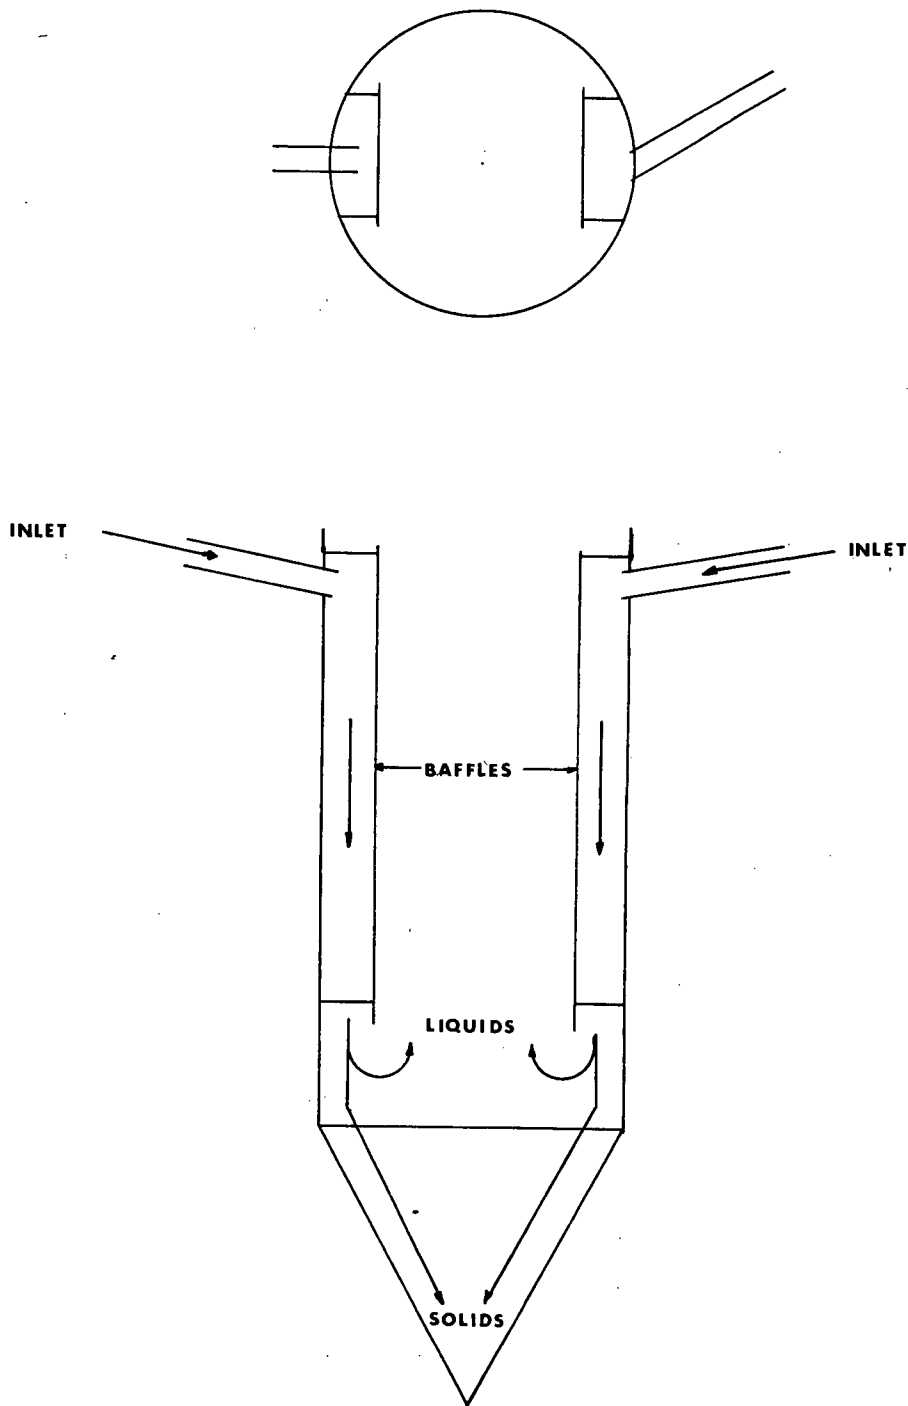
LONGITUDINAL SECTION OF SUMP
